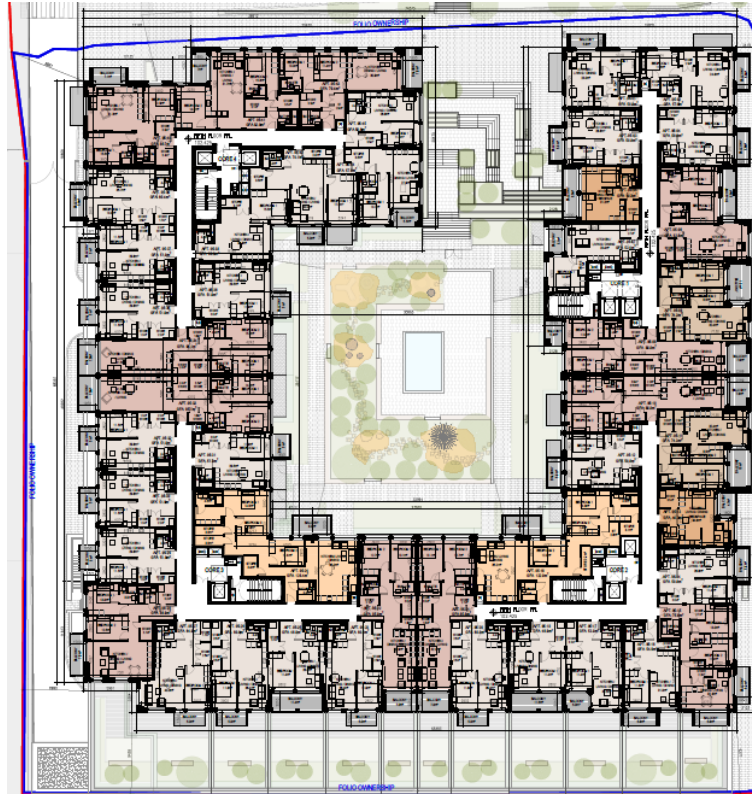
Fifth floor plan. 2 no. studio apartments, 27 no. one-bedroom apartments, 14 no. two-bedroom apartments and 2 no. three-bedroom apartments are provided at this level.
